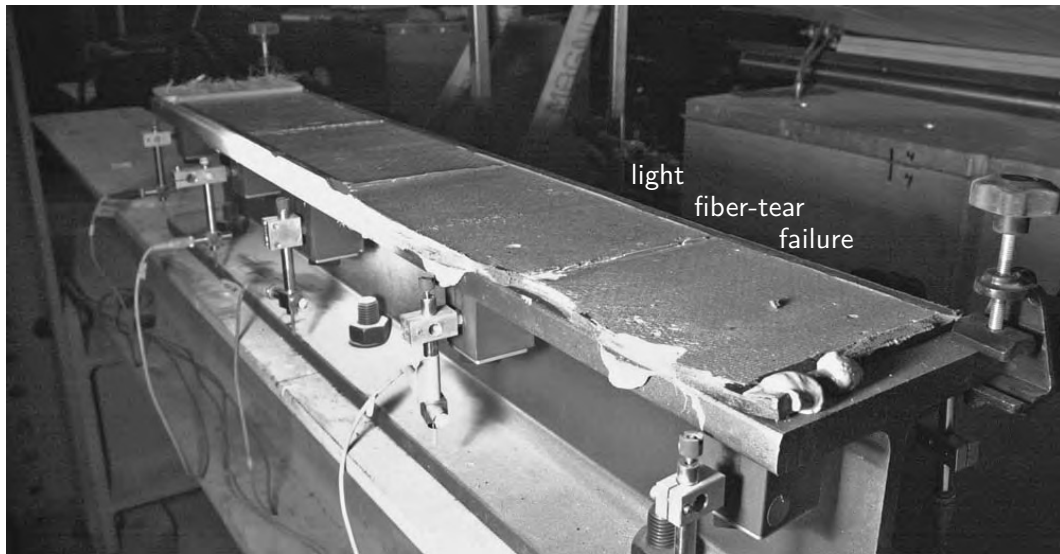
Surface of failed adhesive connection on steel girder (*C1-2*)
